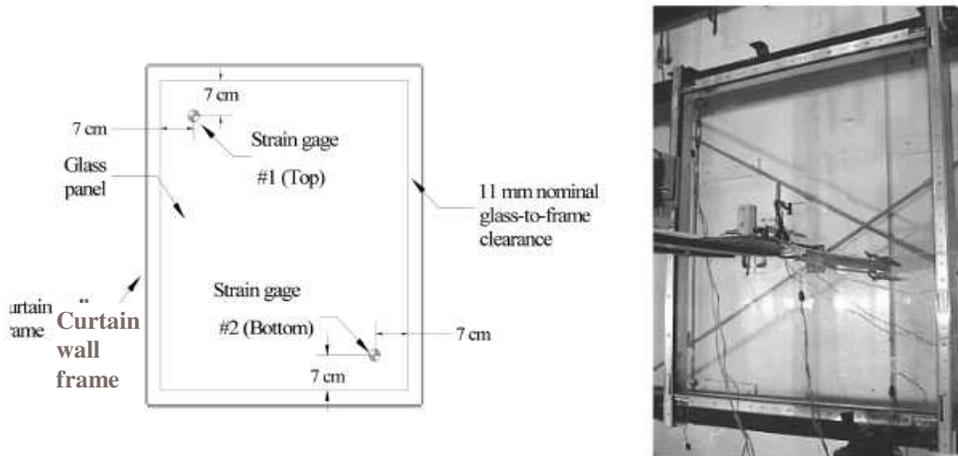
Strain gage locations on architectural glass curtain wall mock-up (Memari et al. 2007)
